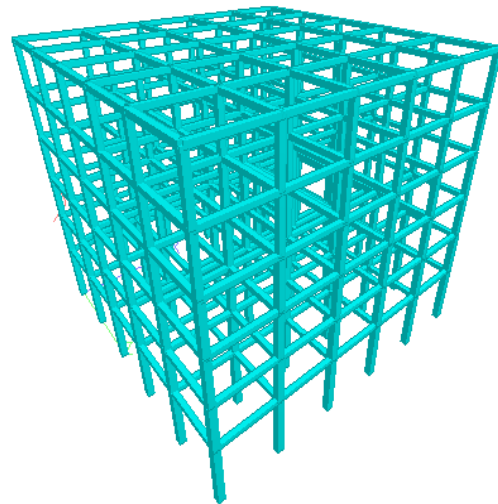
3D: Rendered View of G+5' Model Without Shear Wall
